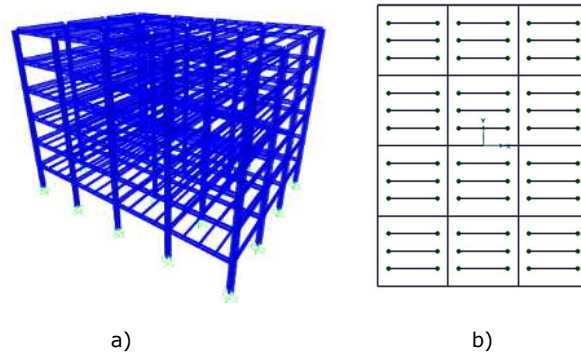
Views of the reference structure: a) isometric view; b) floor plan
